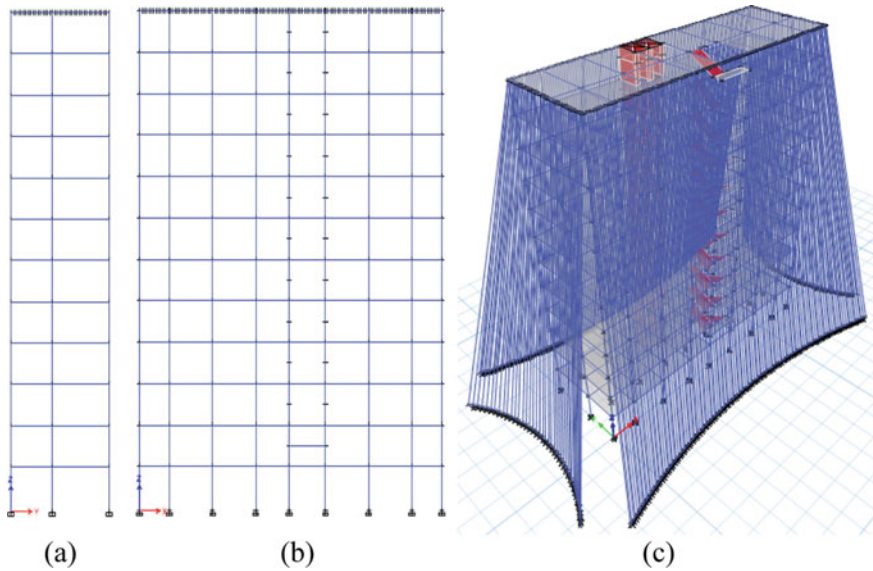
a, b Elevation and c 3D model of CFRP cabled frame
